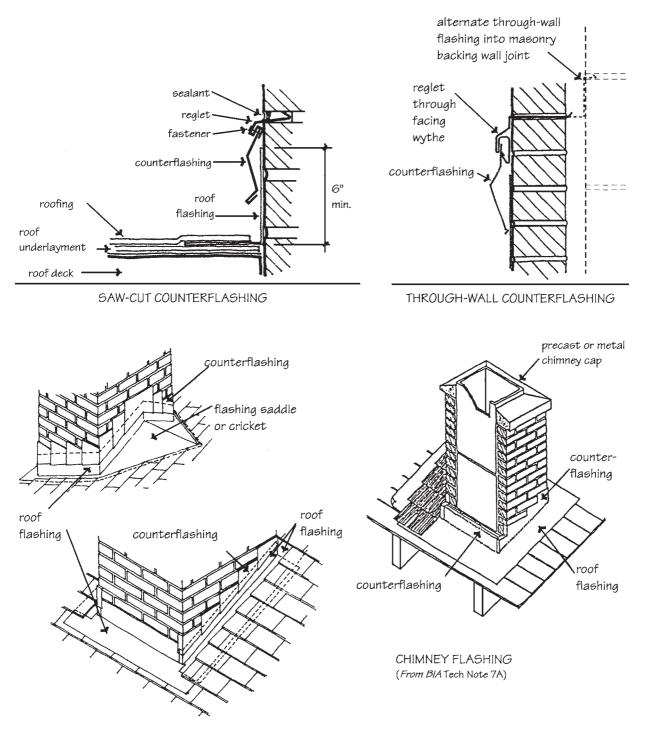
Flashing and counterflashing at roof-wall intersections and chimneys.
